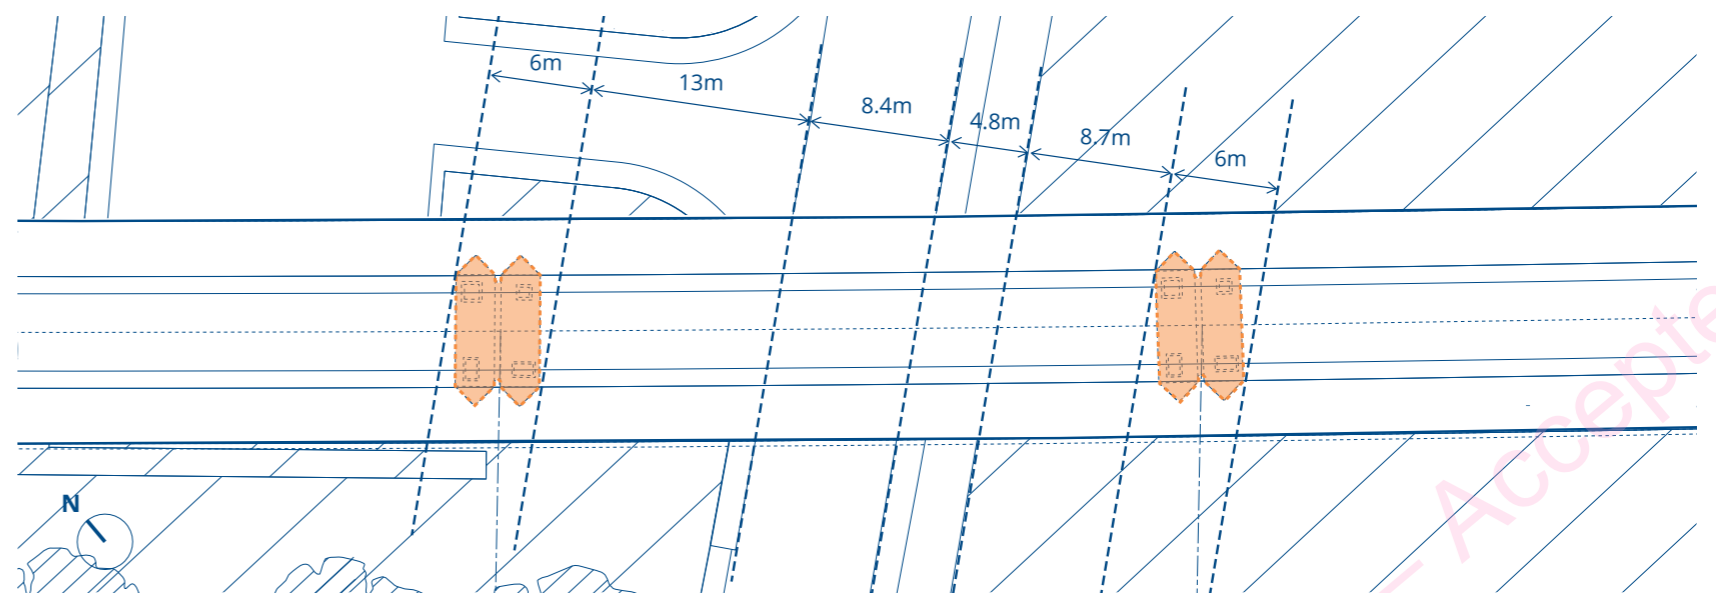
\_ Proposed plan - Moorhall Road crossing
